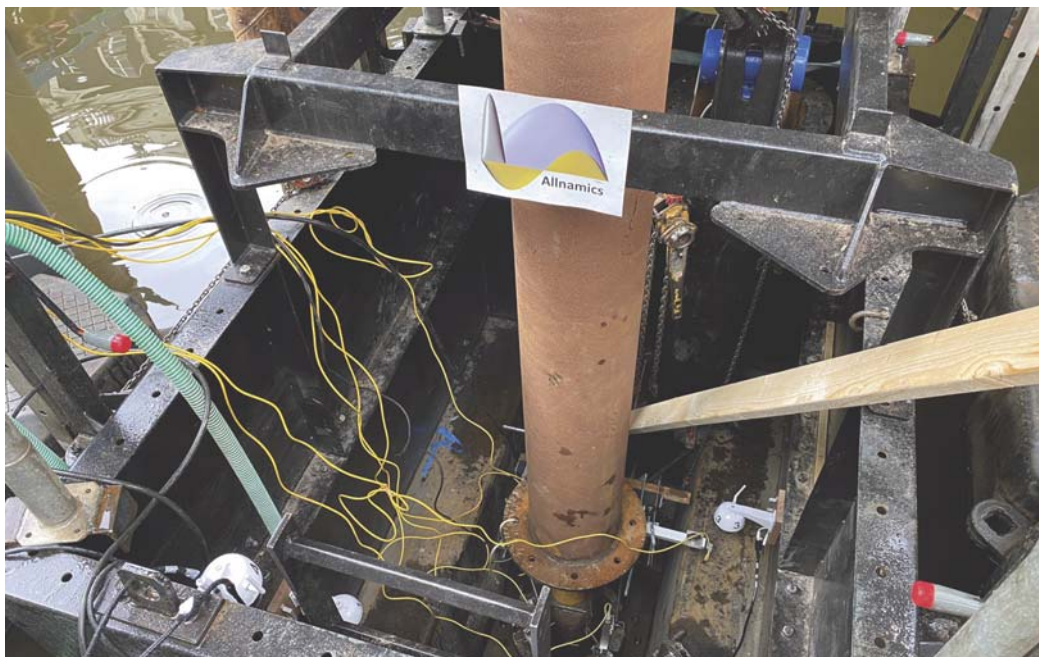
Inside of dry casing around testpile, with follower to kentledge load on bridge deck.
